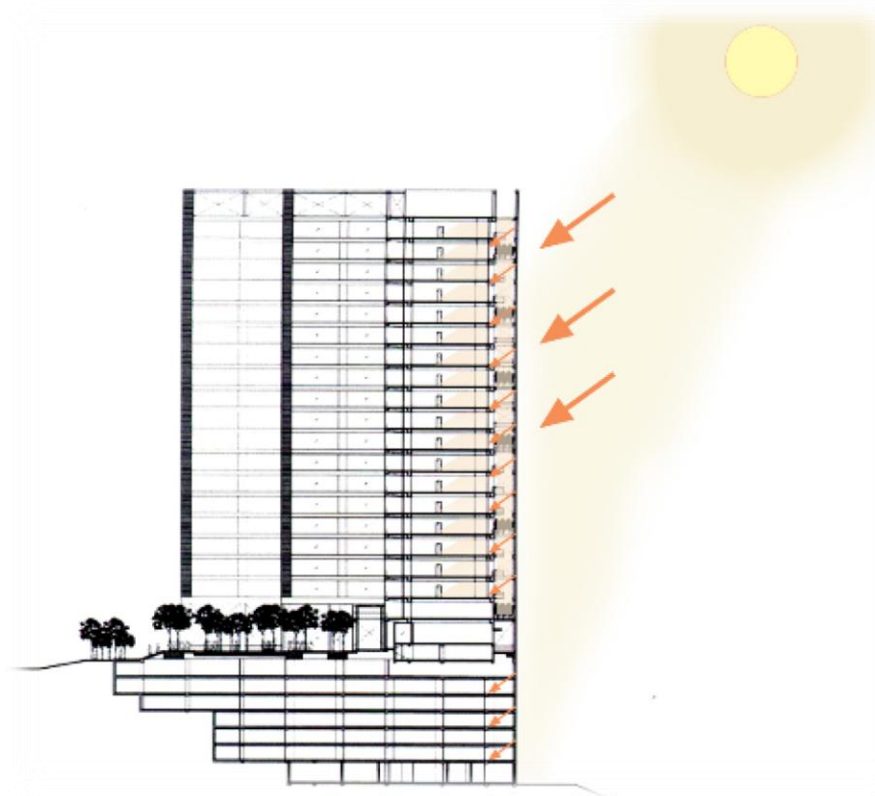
Diagram showing sunlight acting on west façade of PJ Trade Centre
